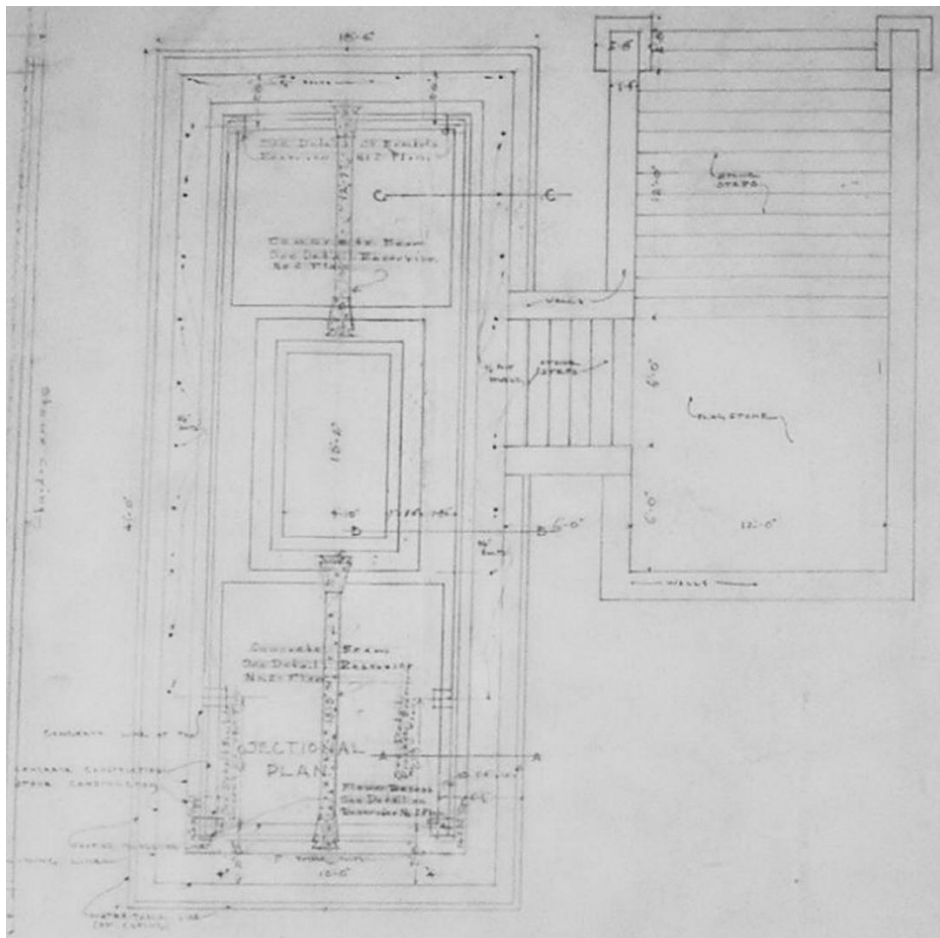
Plan drawing of the west water reservoir at the west pavilion of the Bridge Complex (Source: Caldwell Archives at the Dubuque Museum of Art).
